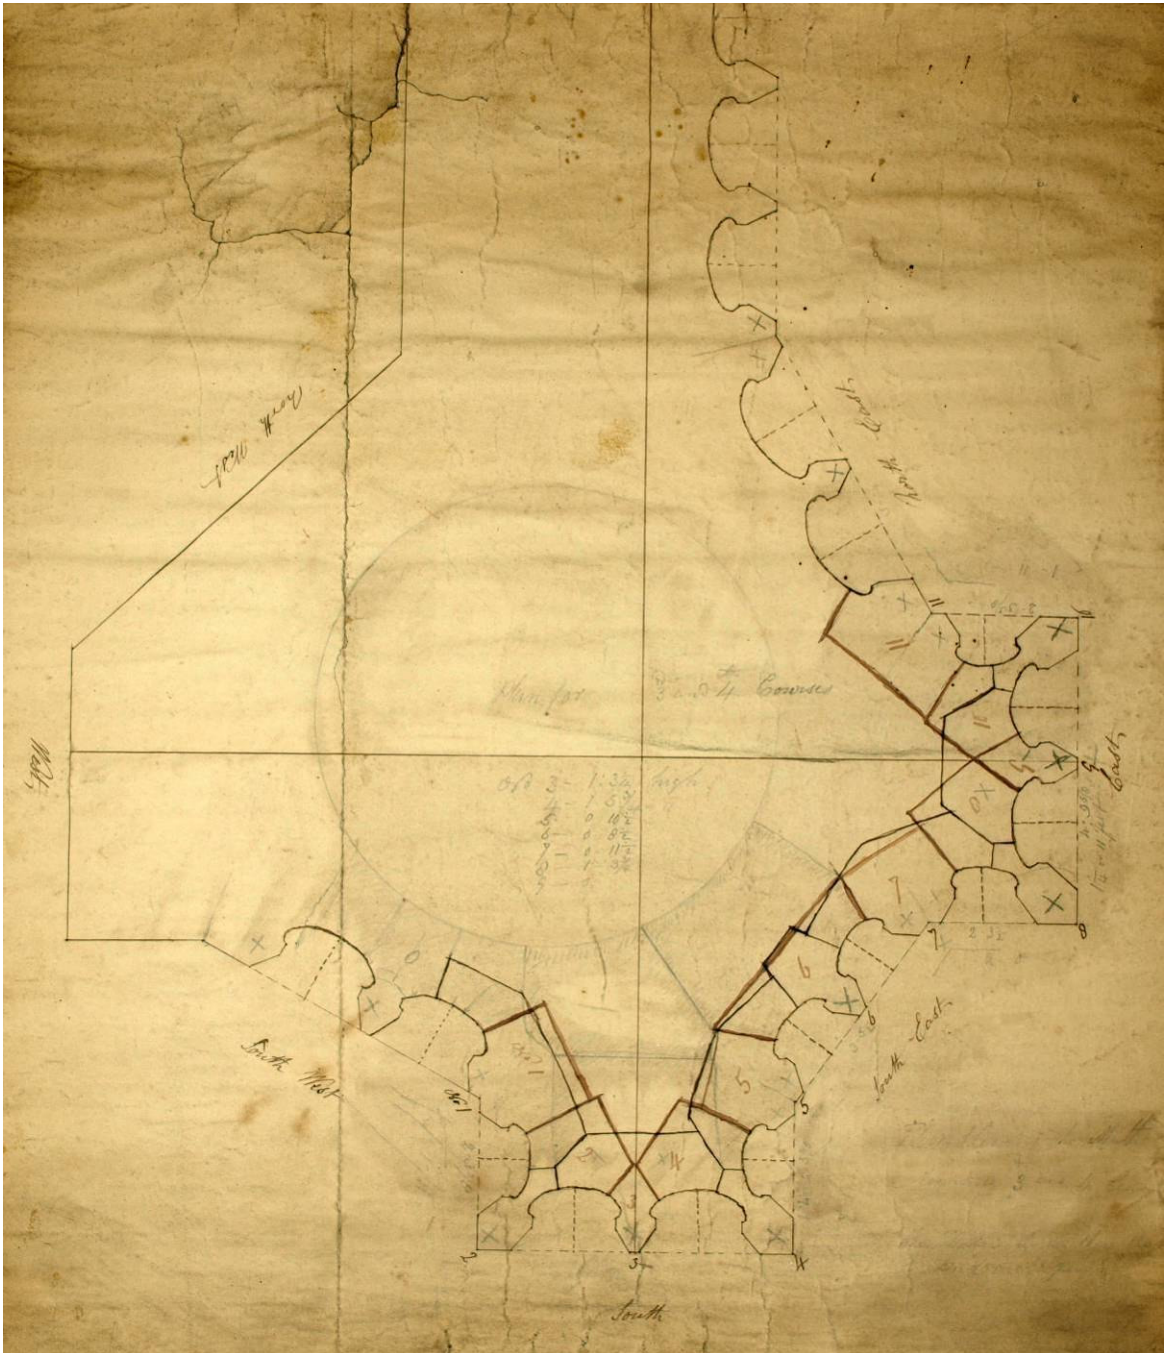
Section through south-east turret at parapet level, 1820s (YML/3/5)
